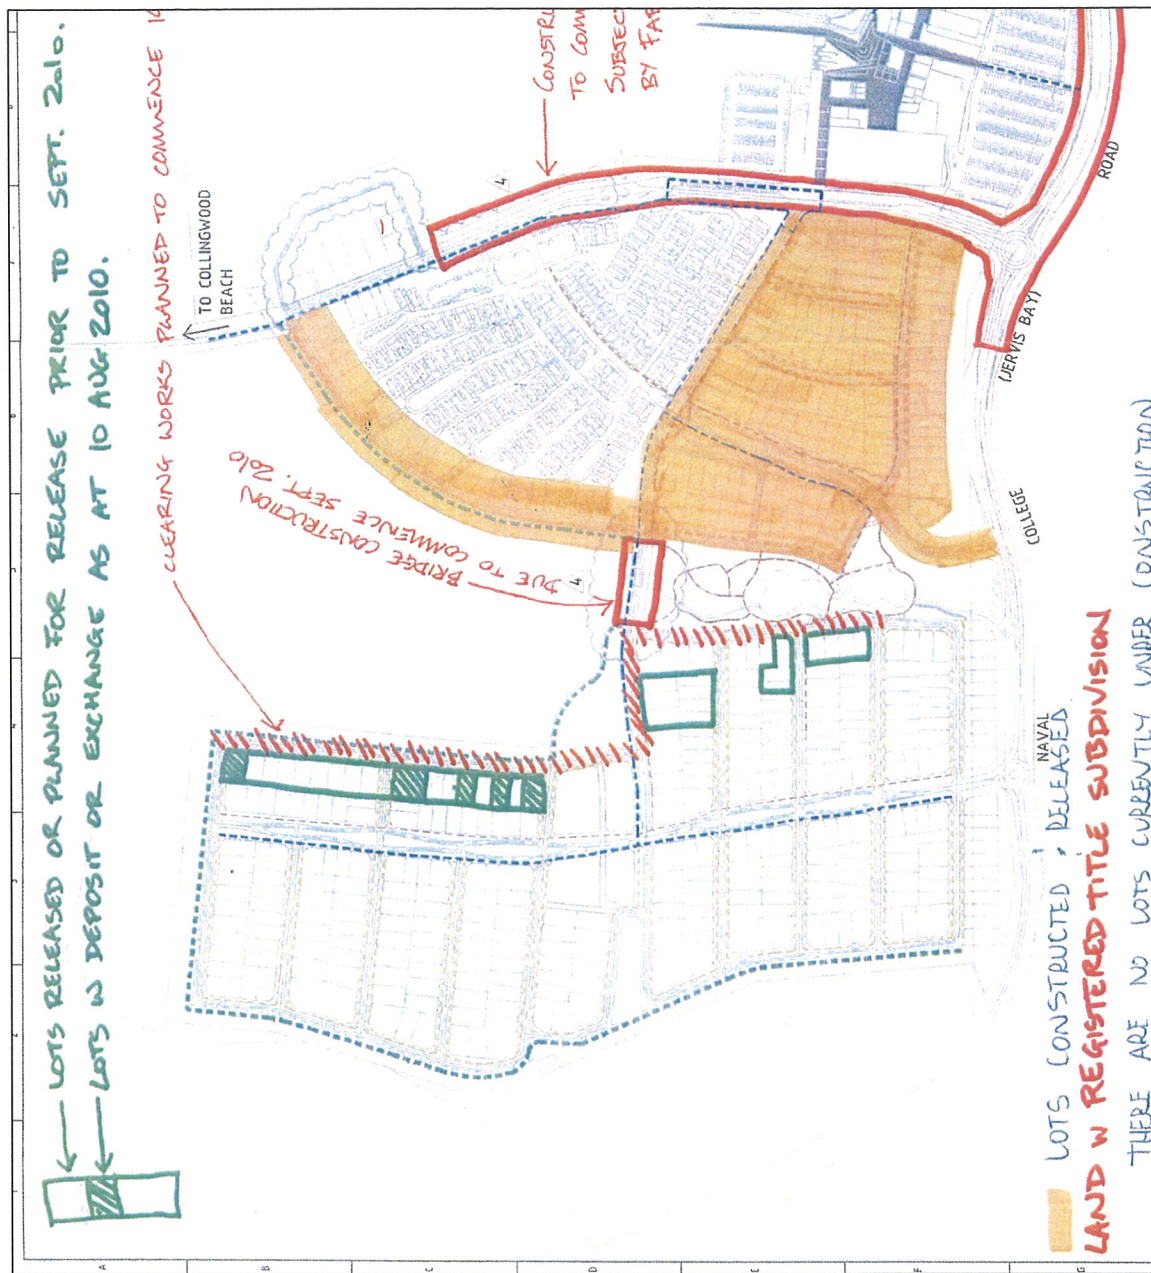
Lots constructed in the Central Village and those being sold in the Western Village
